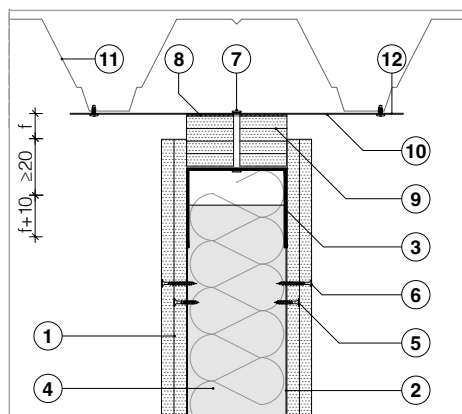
Connecting a partition wall with trapezoidal sheet panels using plasterboard spacers – along the trapeze
